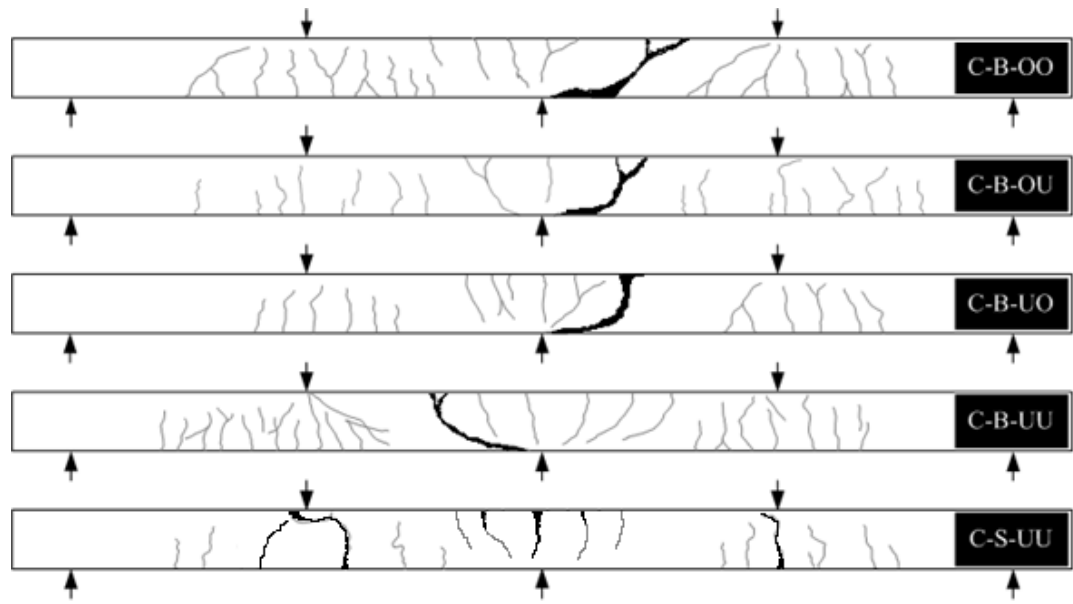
Crack patterns at failure of BFRP reinforced concrete continuous slabs
